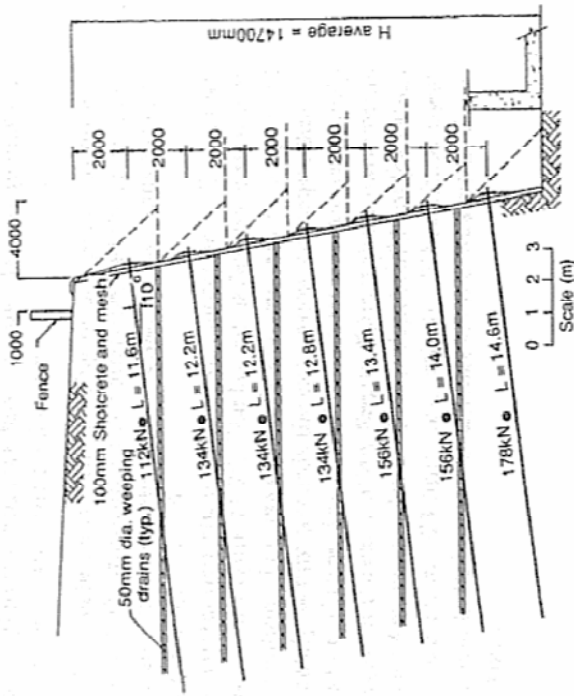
Excavation for tunnel portal at Edmonton, Canada—typical shoring design for Zone 2.<sup>72</sup>
